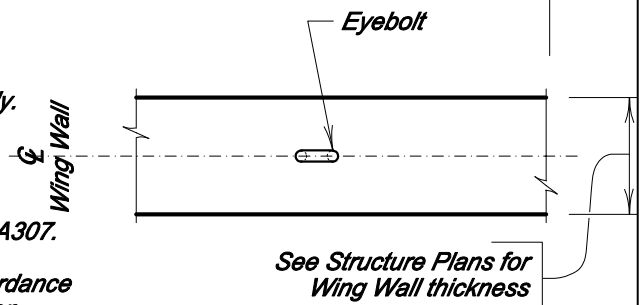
FENCING-ANCHORS FOR BOX CULVERT WING WALLS
